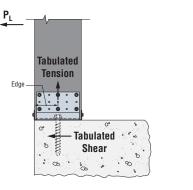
A-1 Single Anchor – One Anchor Shear, One Anchor Tension (tension from moment created from P_L)
